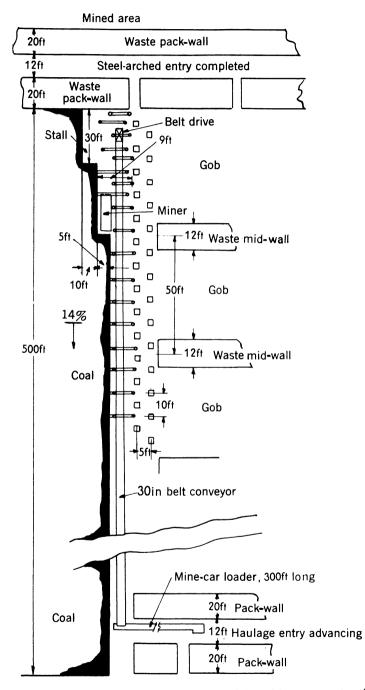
Layout of a 500-ft long-wall face for mining with a Dosco miner.⁽⁴⁾
